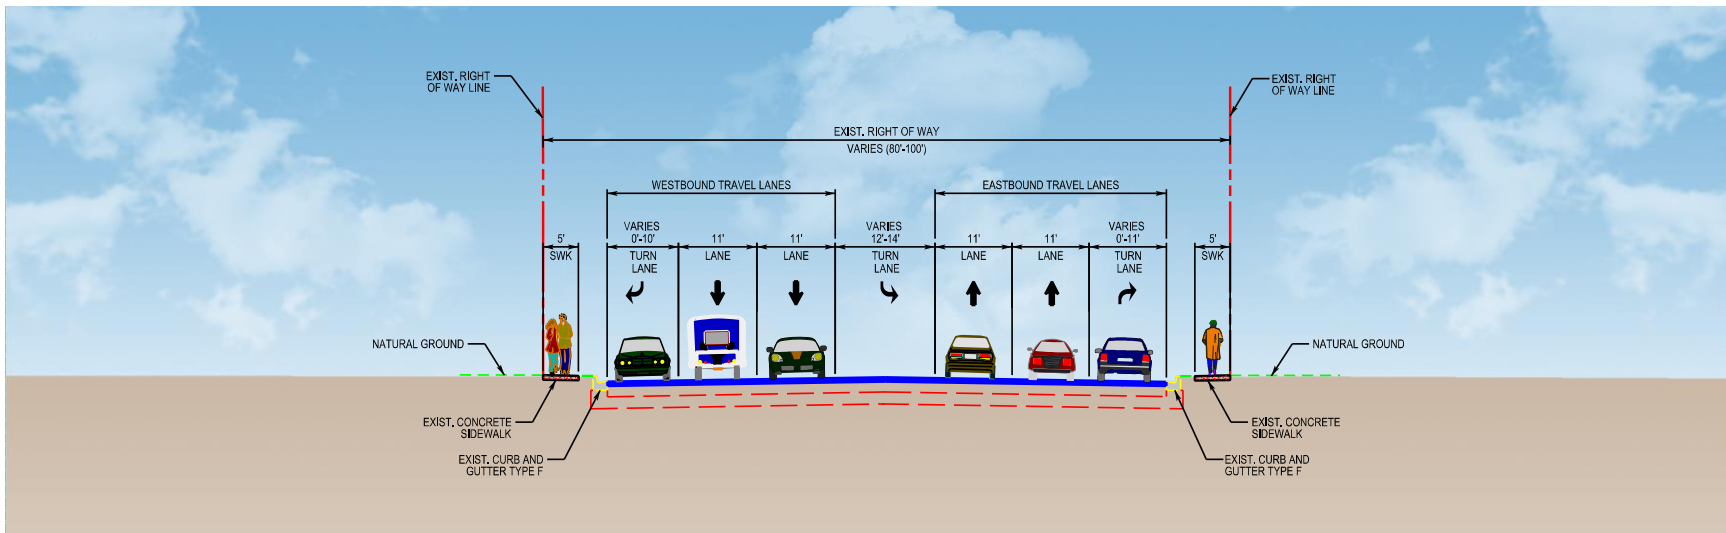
Lantana Road from Shopping Center Drive to Andrew Redding Road
